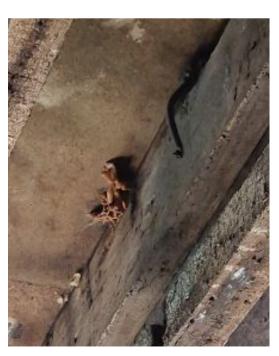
Photo 7 - Fungal growth observed to timber suspended floor
